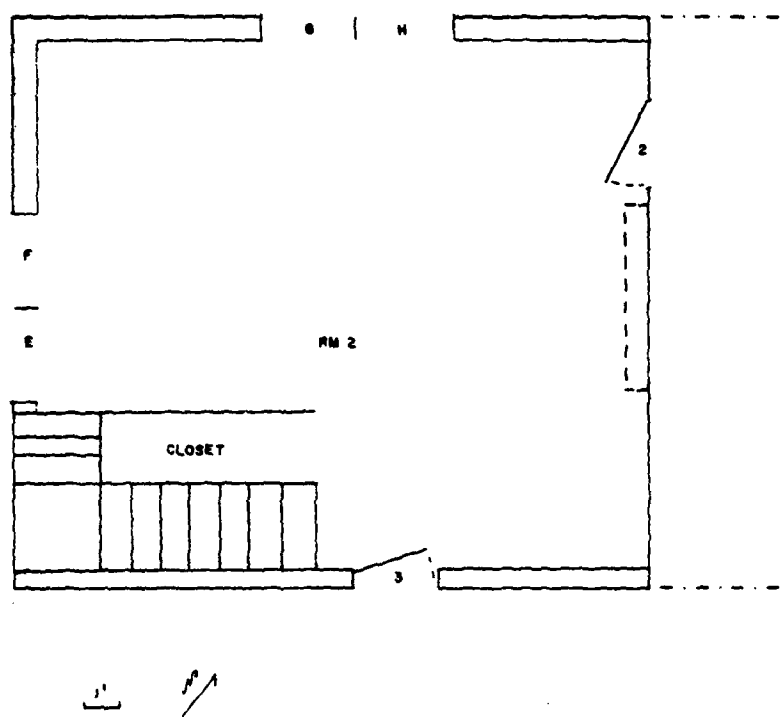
Floor plan Building 1, Room 2, Tract 411.
